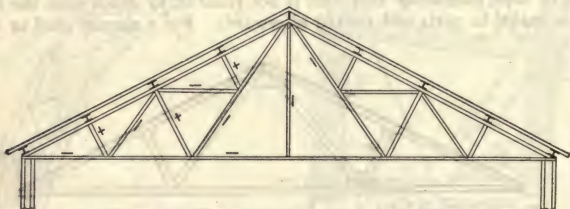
Fink Truss. Spans from Forty to Eighty Feet
